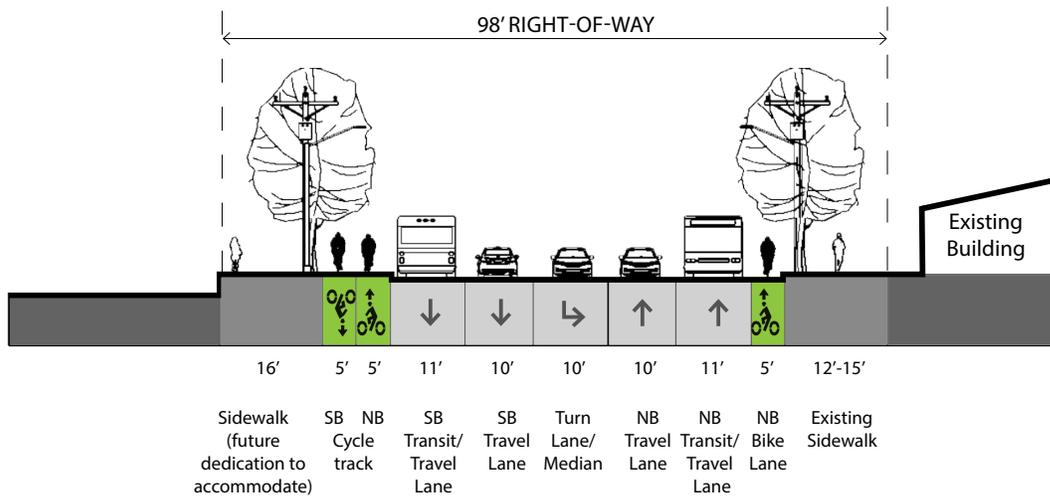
Washington Boulevard Cross-Section, at BART Entrance (Looking East)
